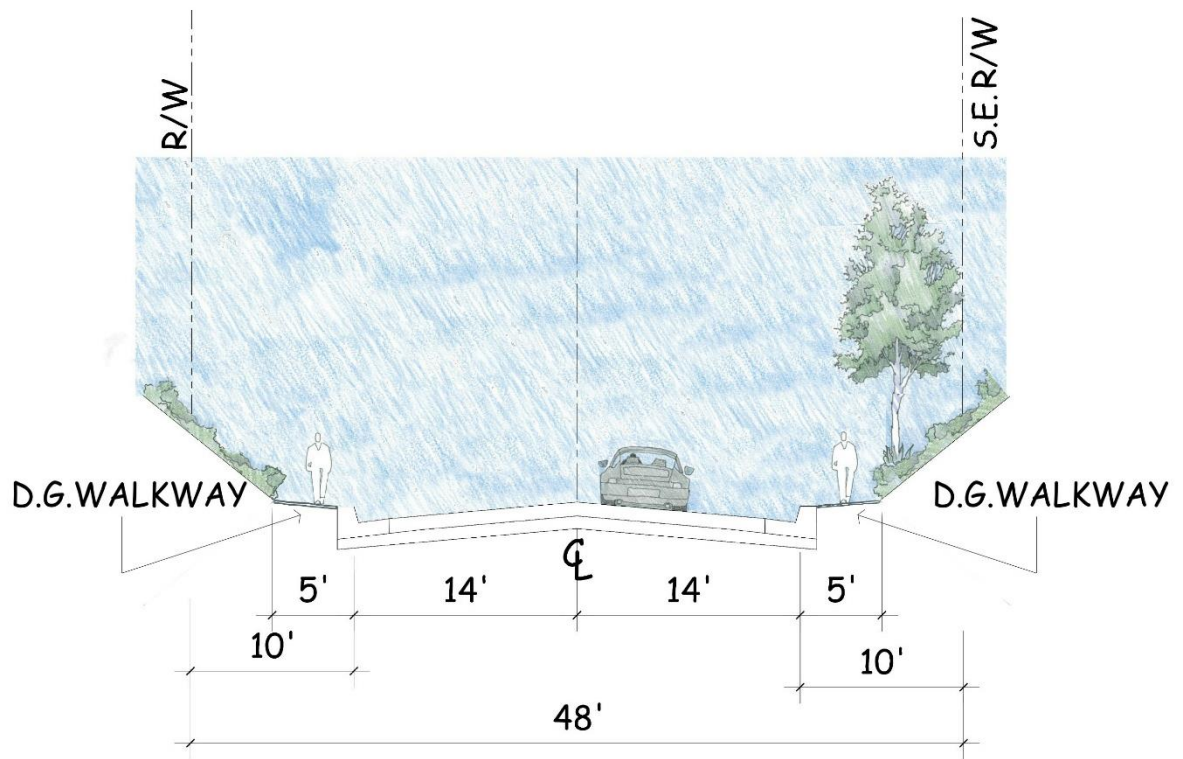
Sections 12 – Public Rural Residential Road (48' ROW)
